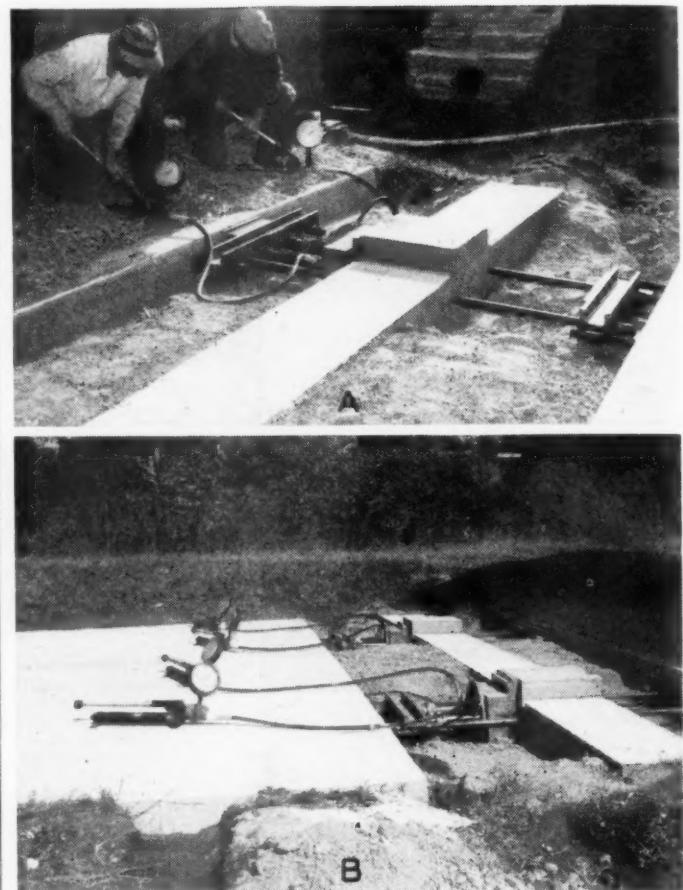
APPARATUS USED FOR APPLYING COMPRESSION AND CONTROLLING THE WIDTH OF THE JOINT OPENING. THE SECTION UNDER TEST IS COVERED BY STRAW IN EACH CASE, (A) CLOSING A JOINT AND (B) OPENING A JOINT.
